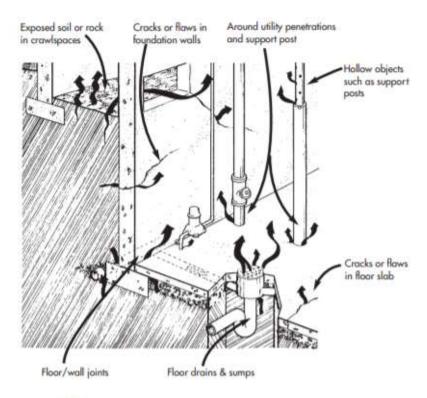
Typical radon entry routes in poured concrete foundation walls and floors.
